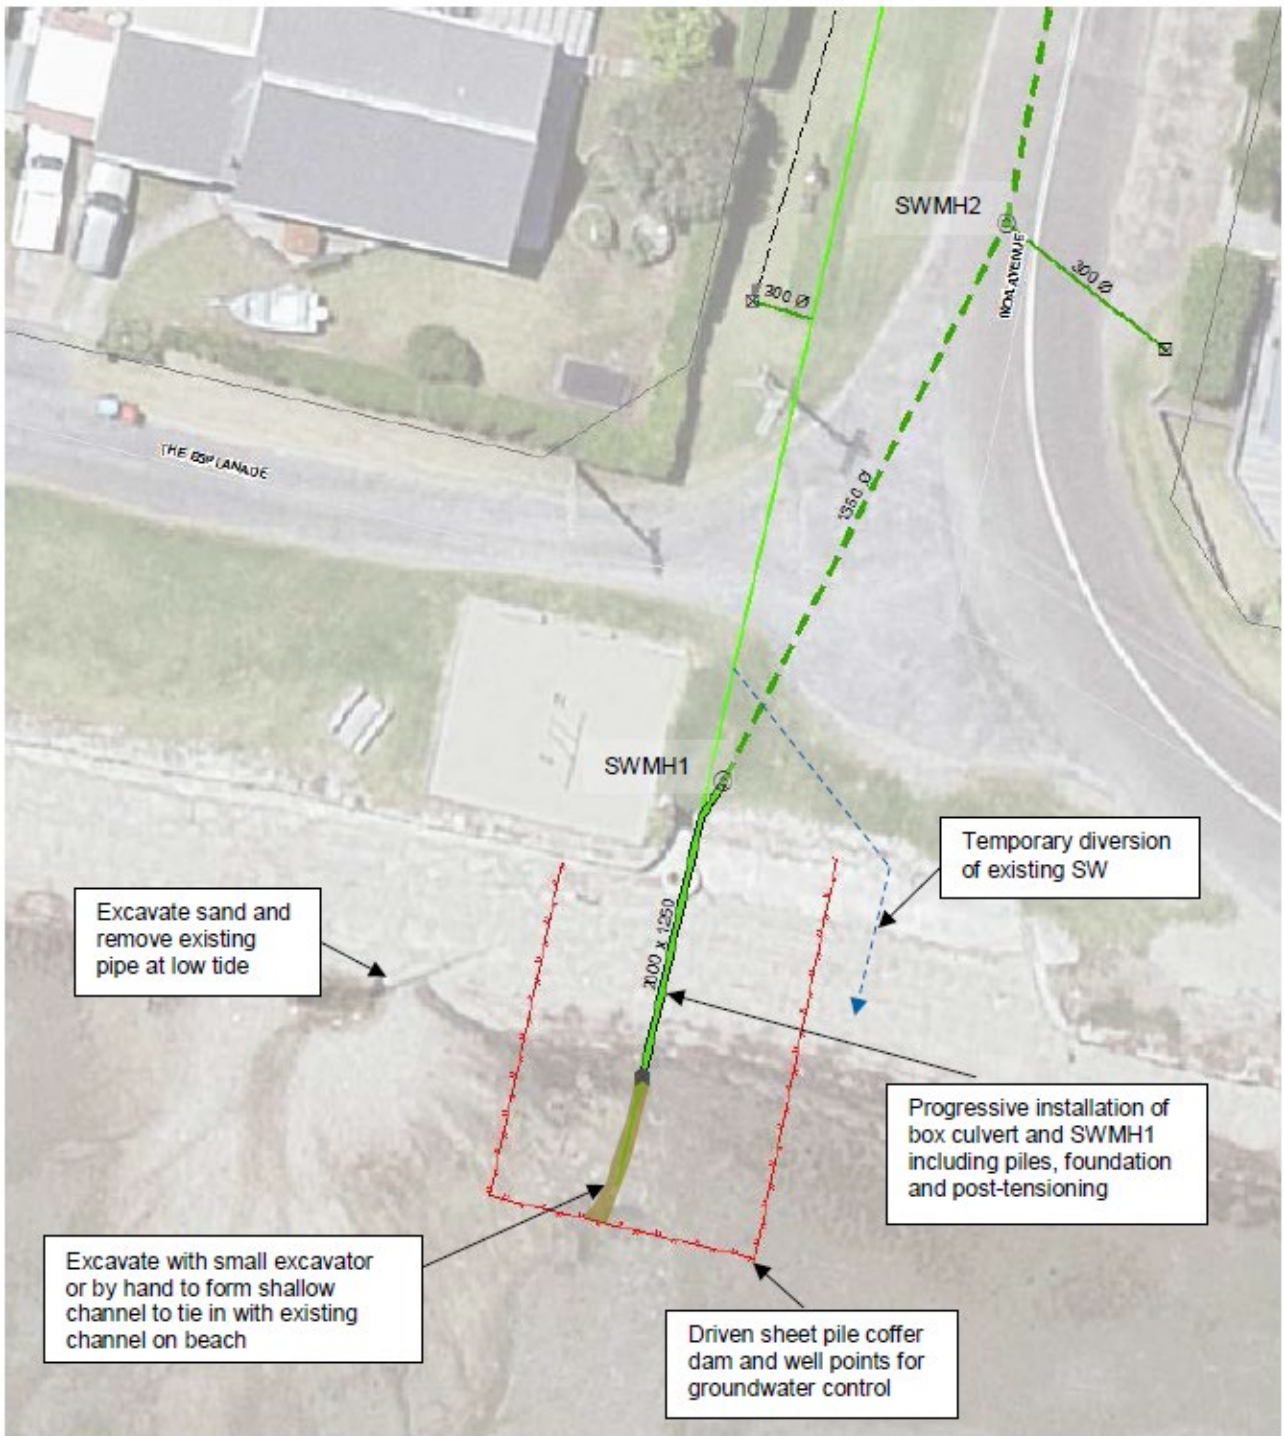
Site location map showing existing structures, proposed area of temporary disturbance and proposed permanent outfall structure¹.
